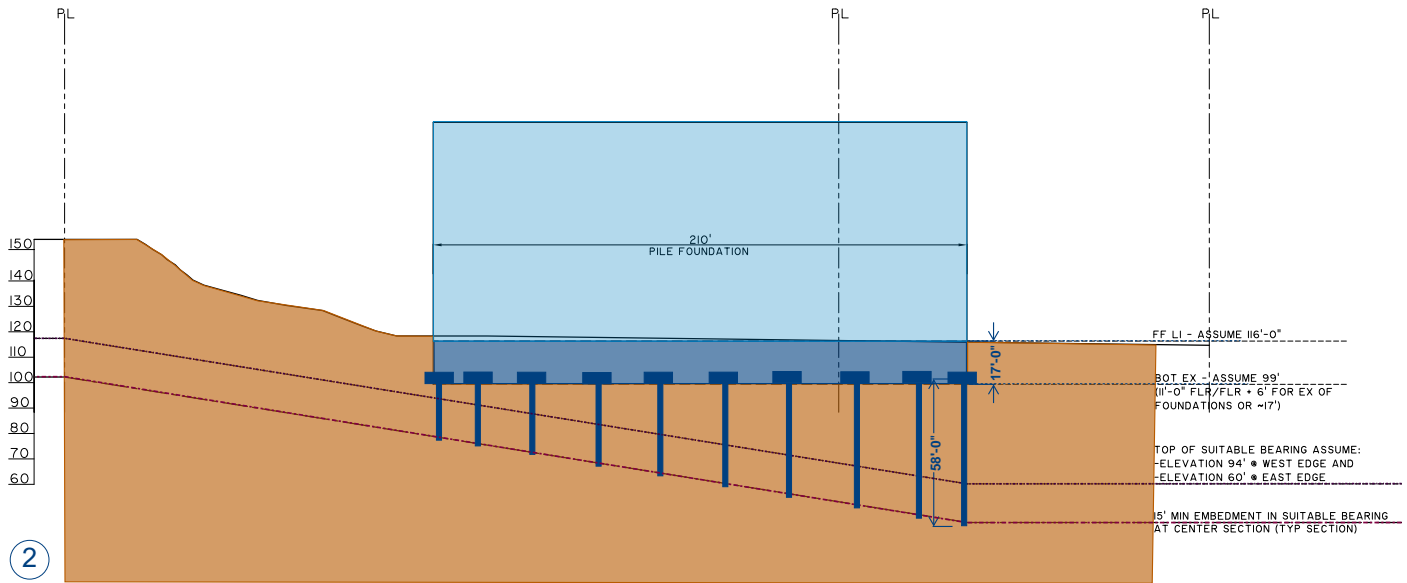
SPUDS Concept 2, Section 2 Through South Building Excavation, Looking North
